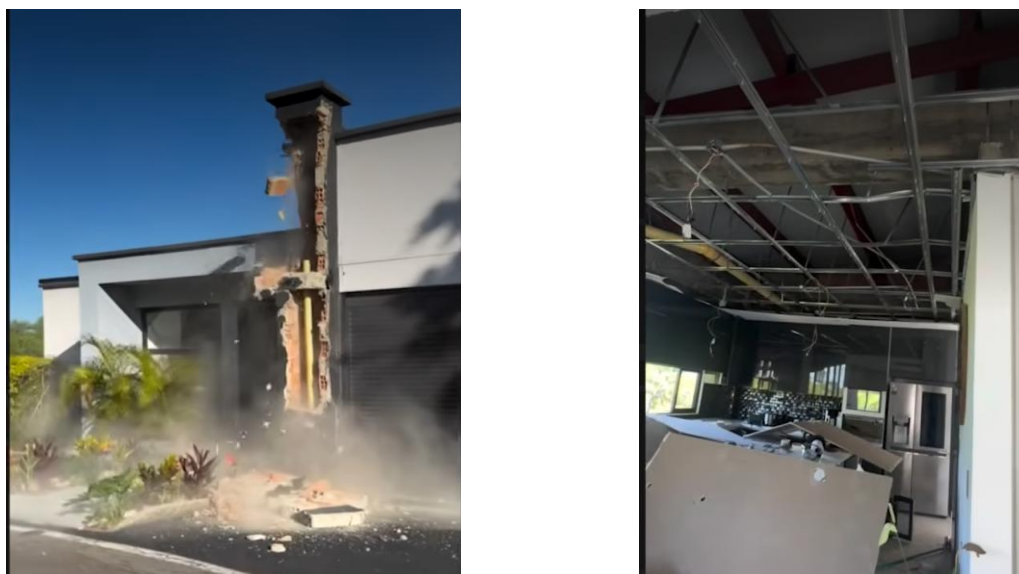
Damage to residential houses – hollow brick walls, and internal ceilings²⁹
